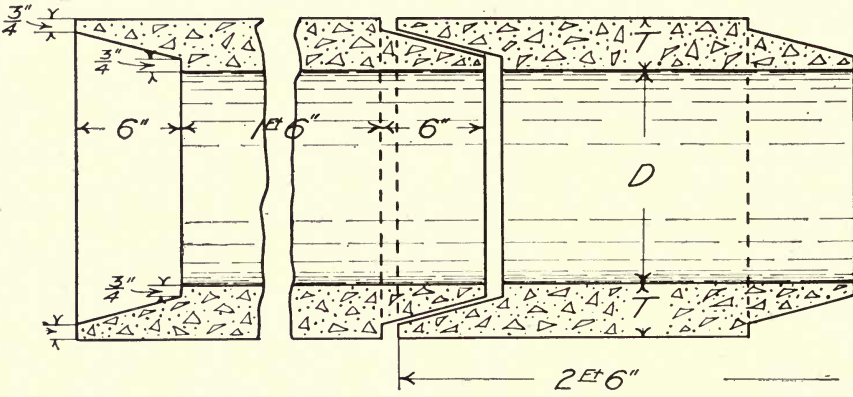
LONGITUDINAL SECTION OF SEWER PIPES.
